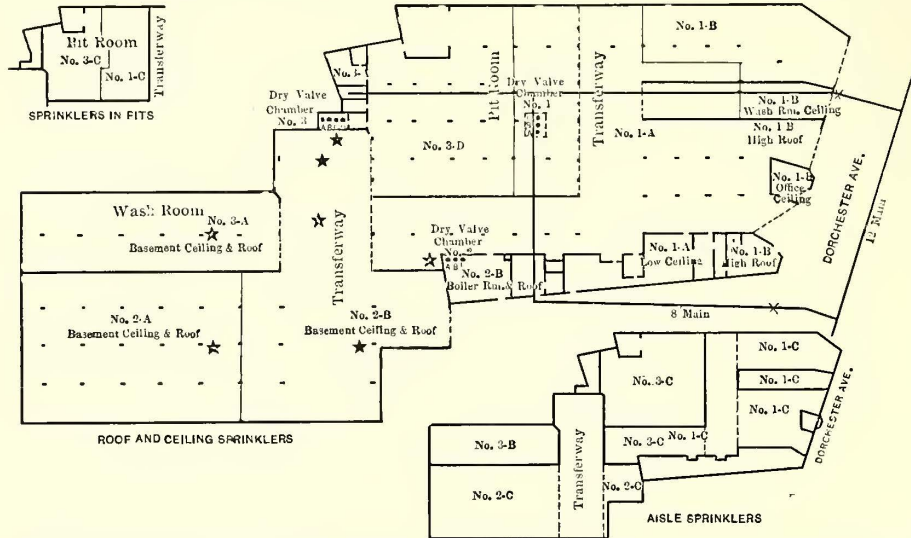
Fire Protection of Milton Car House—Location and Lettering of Dry Valves, with Section Operated by Each. The Stars Show Location of Sprinklers, Drip Pipes and Drip Valves in Basement
